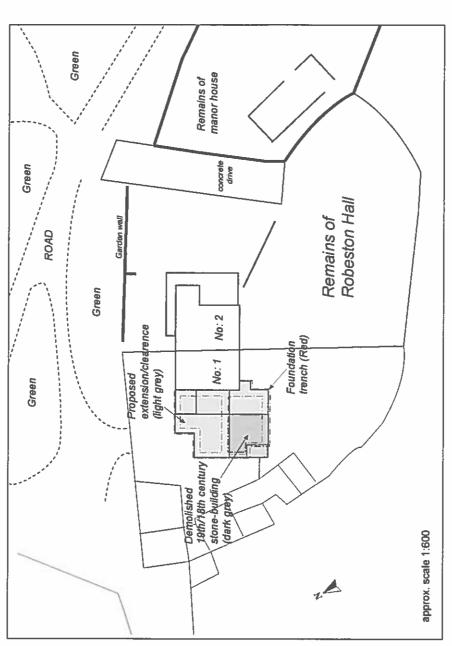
Site plan showing proposed extension and associated foundation trench (outlined in red).
